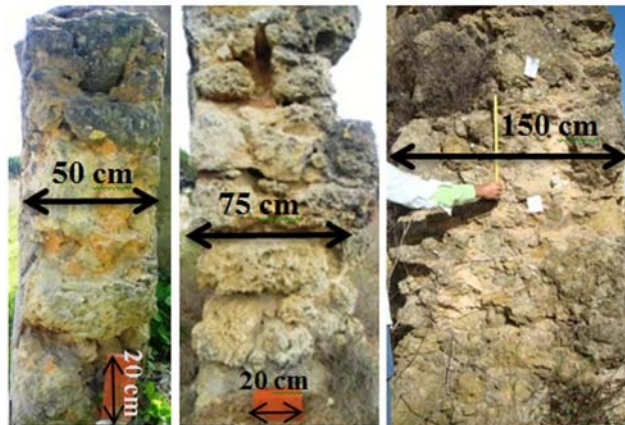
Masonry typology: (a) single leaf wall; (b) and (c) multi-leaf wall
